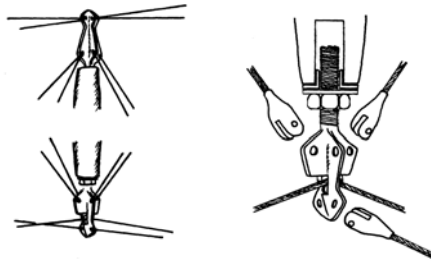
Cable-strut connections and lower strut end joint with turnbuckle.
